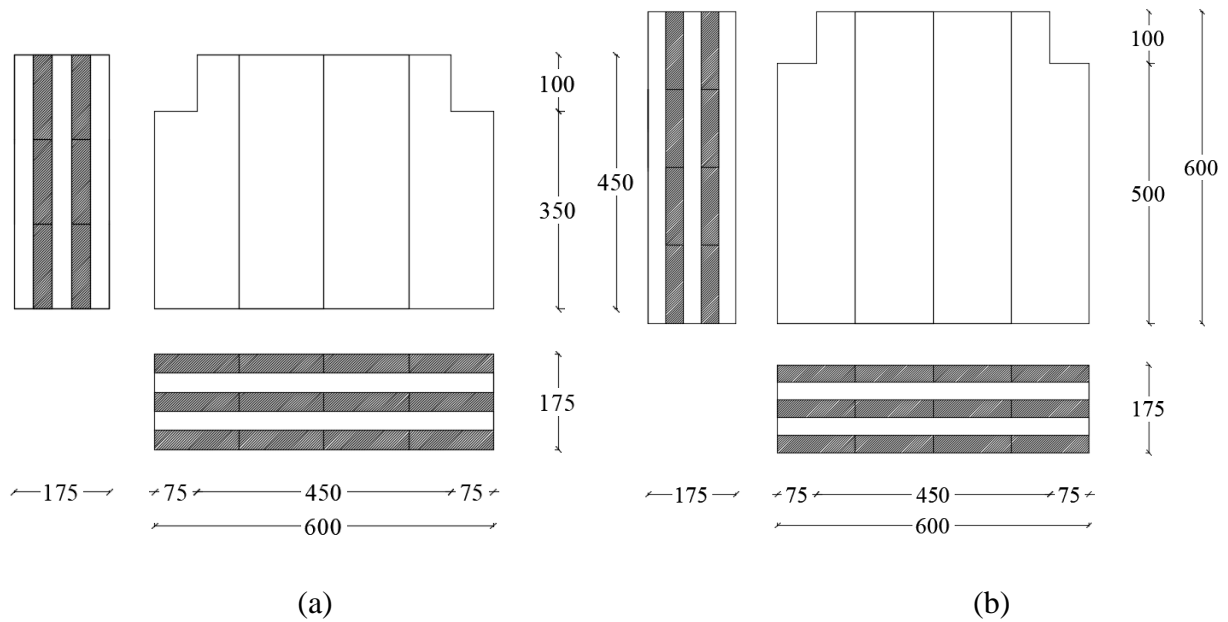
two specimen dimensions, (a) Type A; (b) Type B
